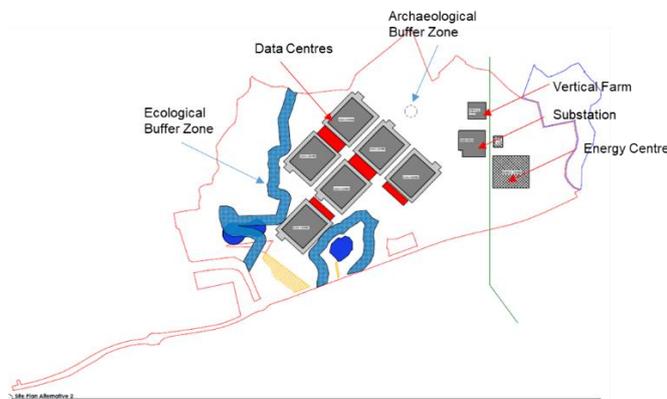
Proposed Layout (Layout 3) Energy centre located further south than Option1 (Proposed Development)
